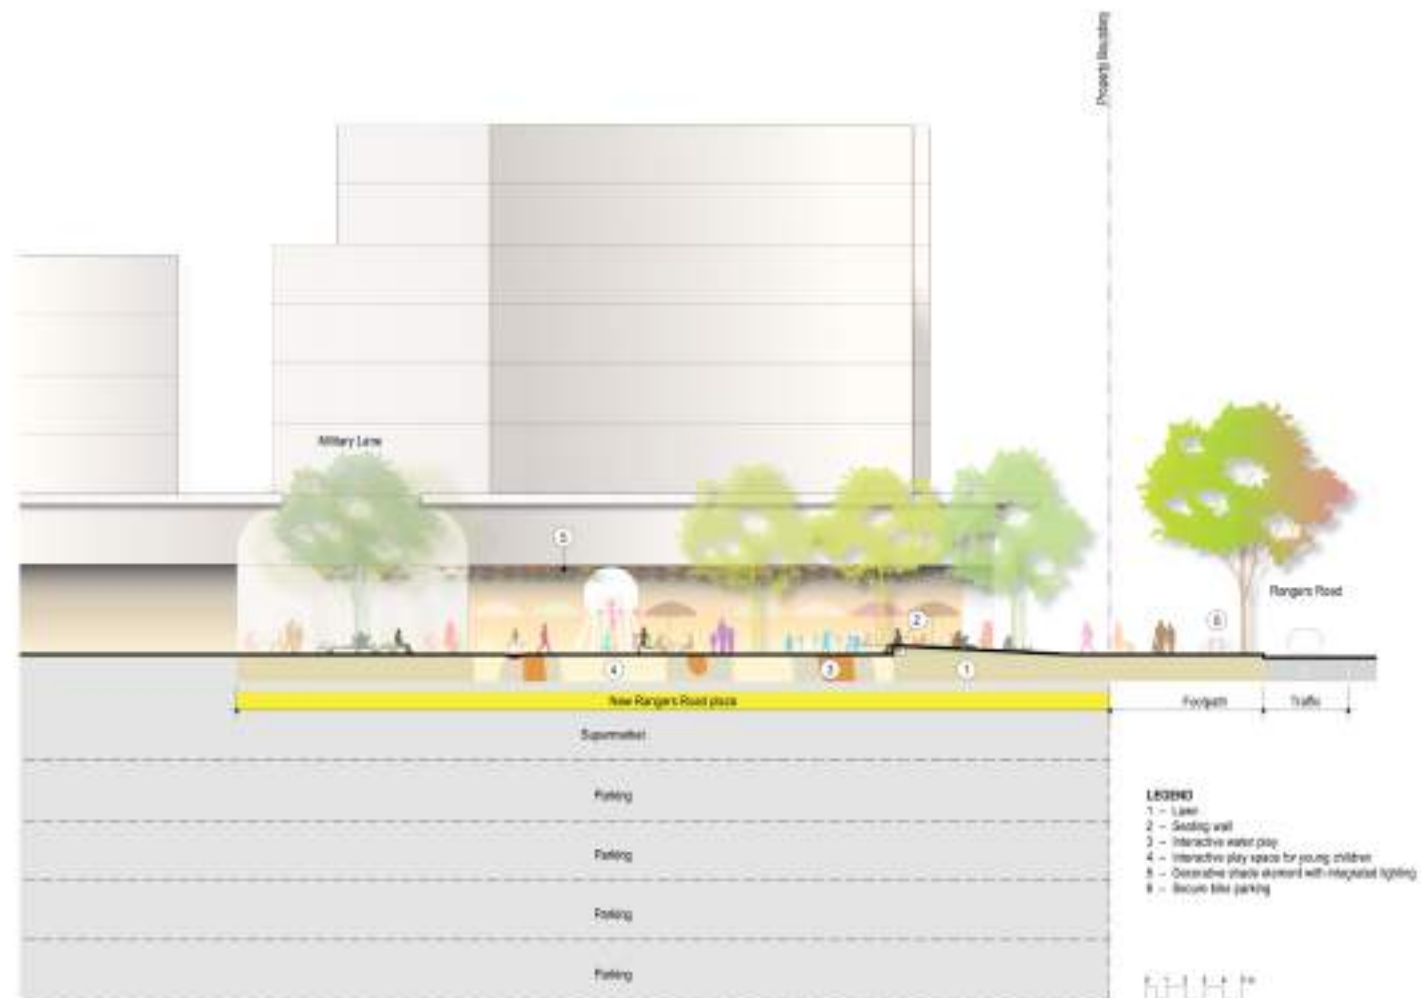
Cross section-elevation of Rangers Road Plaza
